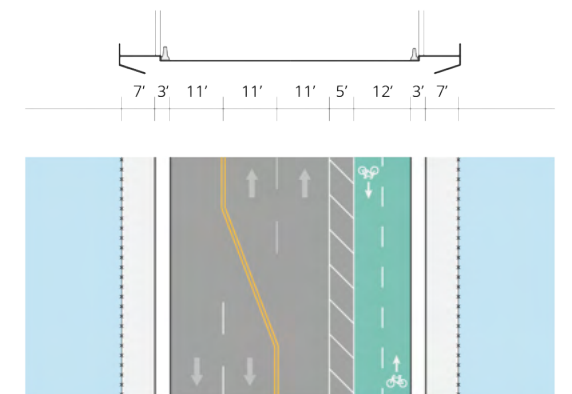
PROPOSED SECTION OF ROUTE 1A CORRIDOR AT ADDISON STREET
